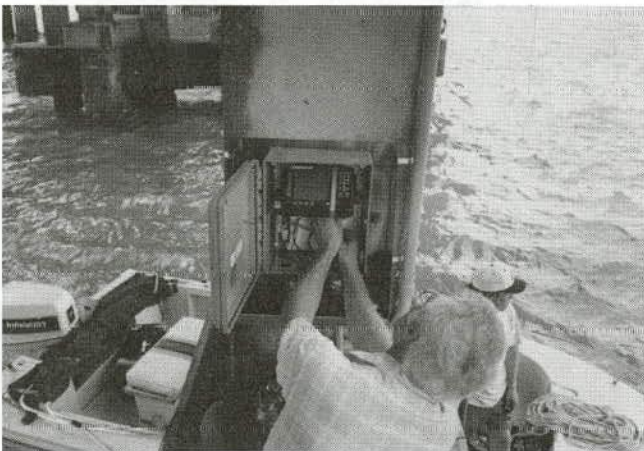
Sonic instrument enclosure at Johns Pass bridge (Site FL1).
